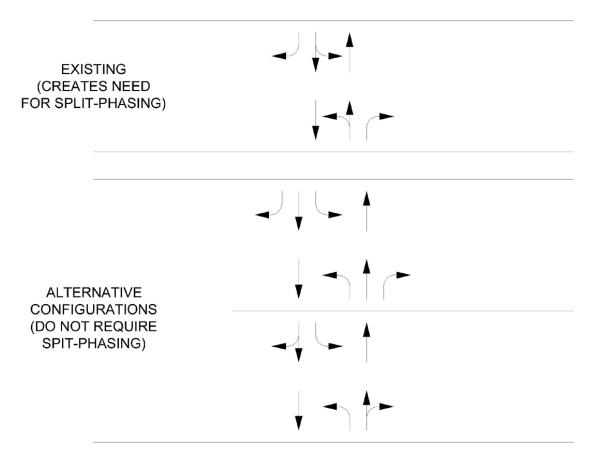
Typical Minor Street Lane Configuration
